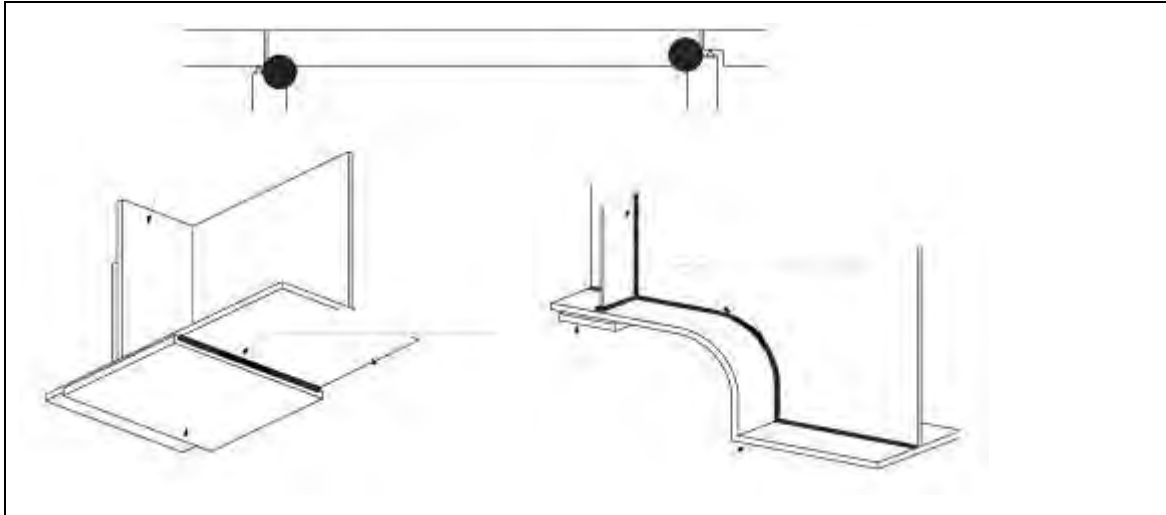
Cracks Appearing at Welded Portions of Sole Plates and at Changes in Cross-sections
